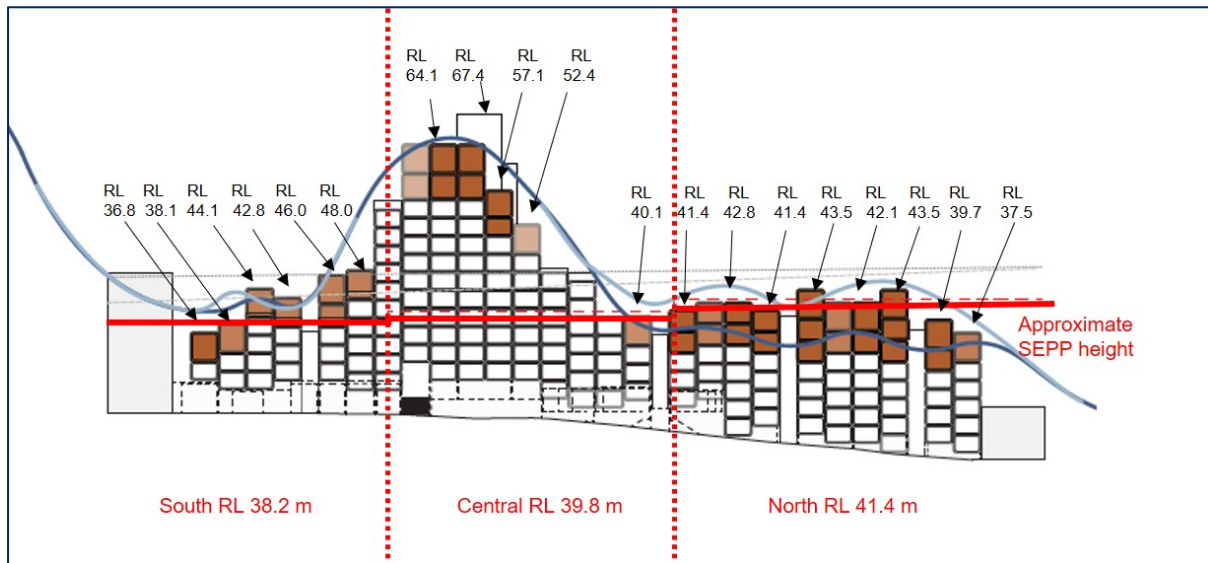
| The SEPP maximum building height (shown in red) with the existing building (shown in white) and the proposed additions to the building (shown in brown) (Base image source: EIS Appendix H, Architectural Design Report)
